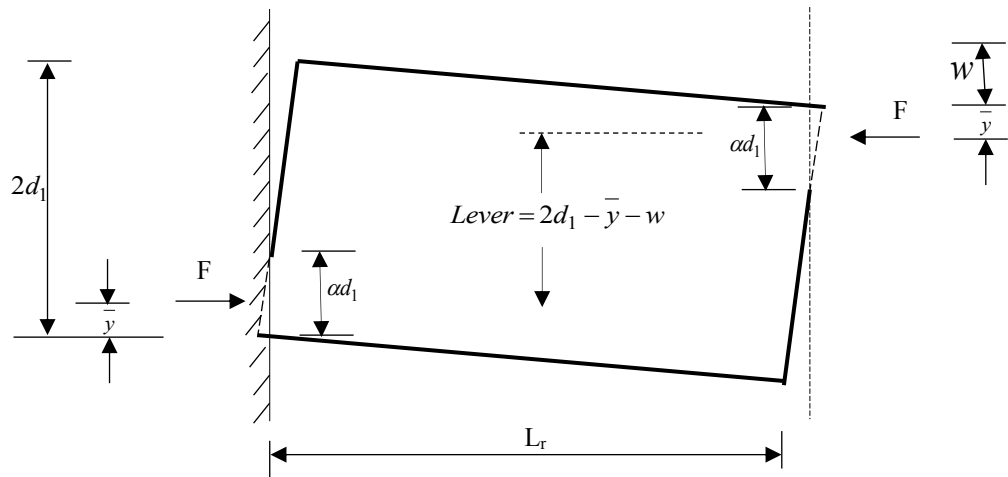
Plan and elevation view of RC assemblages with idealised geometry for half span laterally restrained slab after McDowell et al (1956) (Rankin & Long 1997b)
